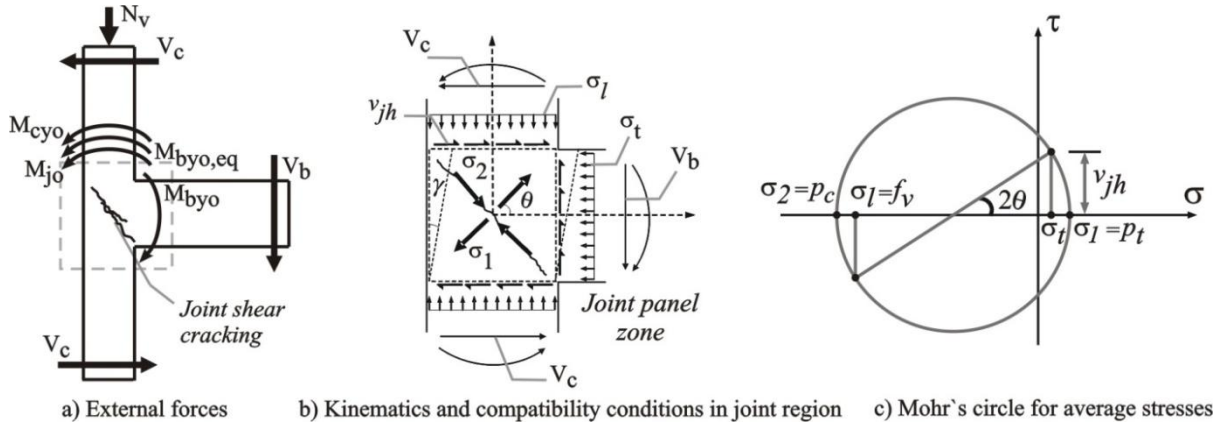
External and internal actions on as-built 2D plane frame joint and associated stresses
